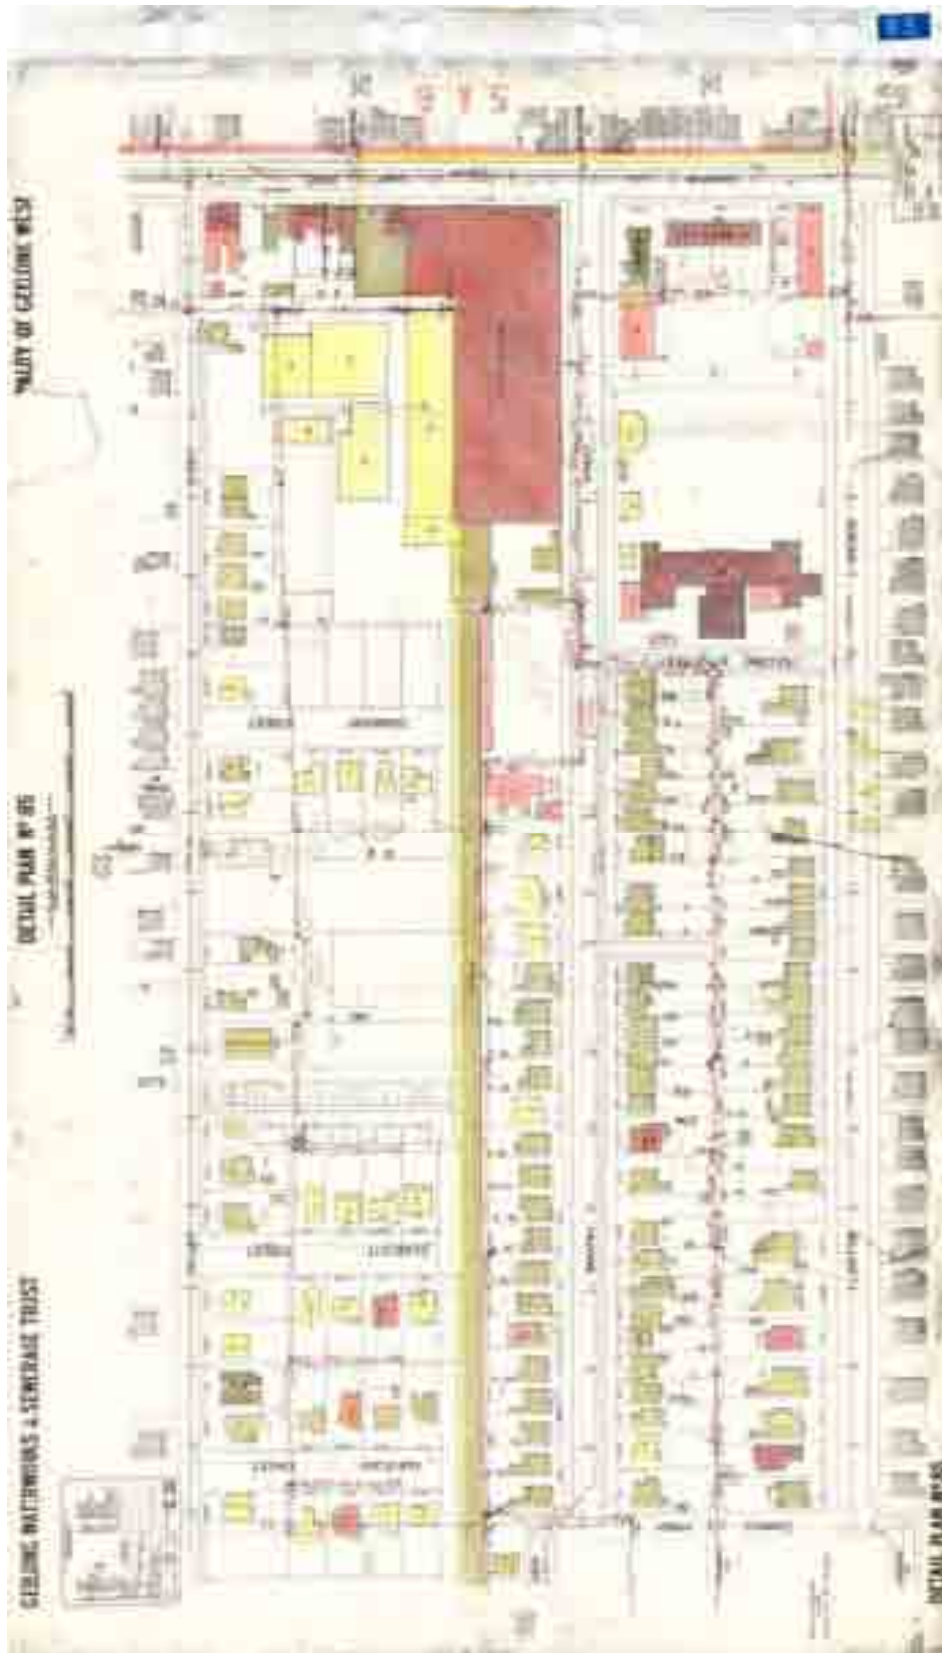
Geelong Waterworks & Sewerage Trust Detail Plan No. 85, c.1912 (revd. 1914, 1917 & 1967). Source: Barwon Water collection.
